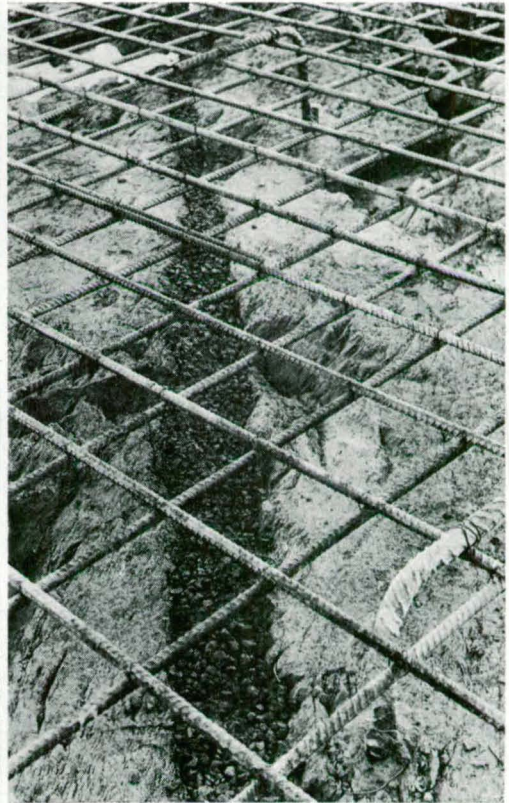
Narrow crushed seam exposed in the floor of the spillway channel excavation after wet seam treatment.
